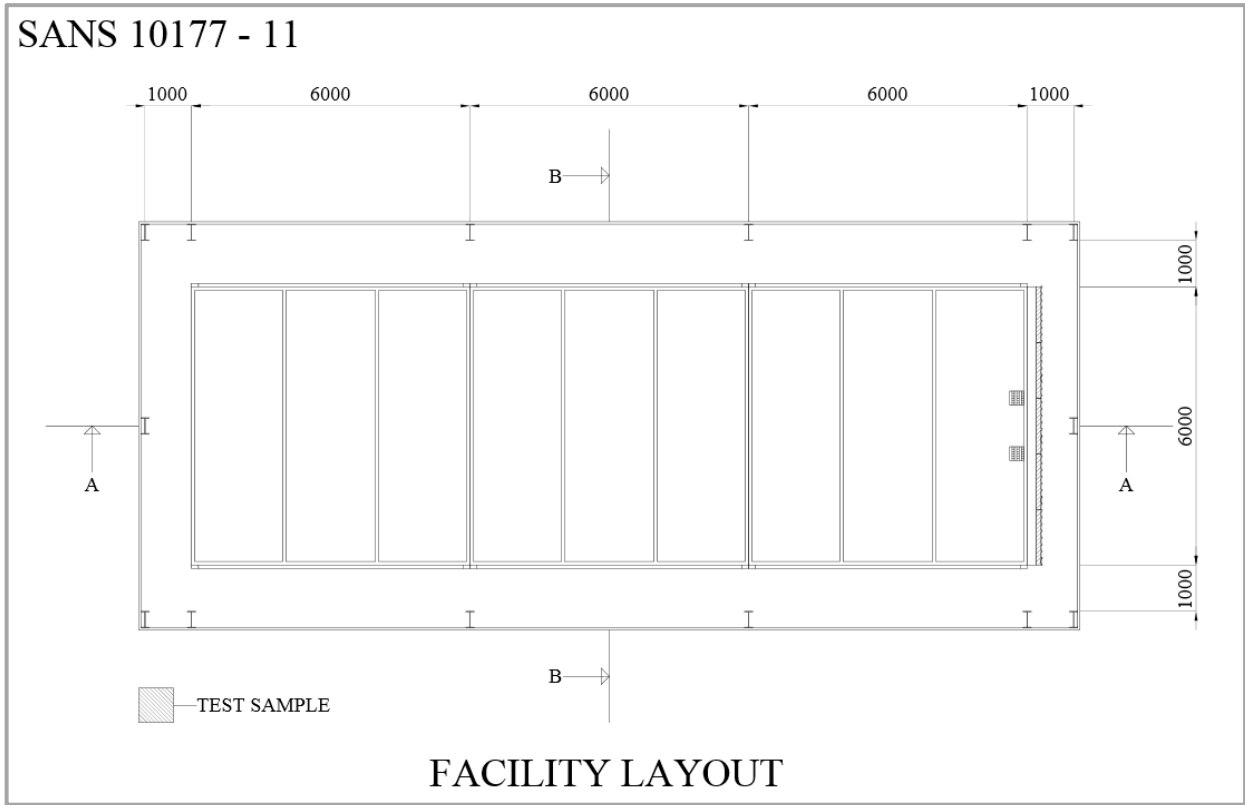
SANS 10177-11 facility plan view for vertical test
